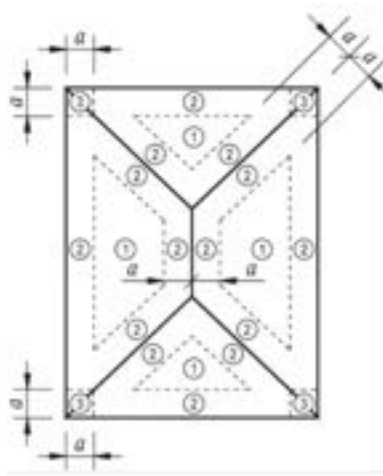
24: Proposed zoning area for hip roof with overhangs; same as ASCE 7-10
